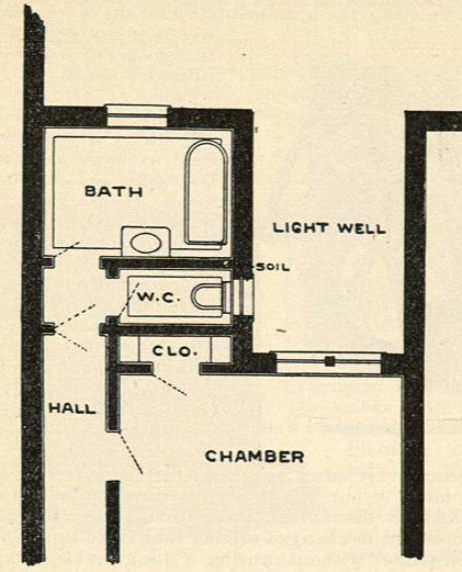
Second-Floor Plan Showing Location of Bath-Rooms, Water-Closets, and Chambers on an Inside Lot.
